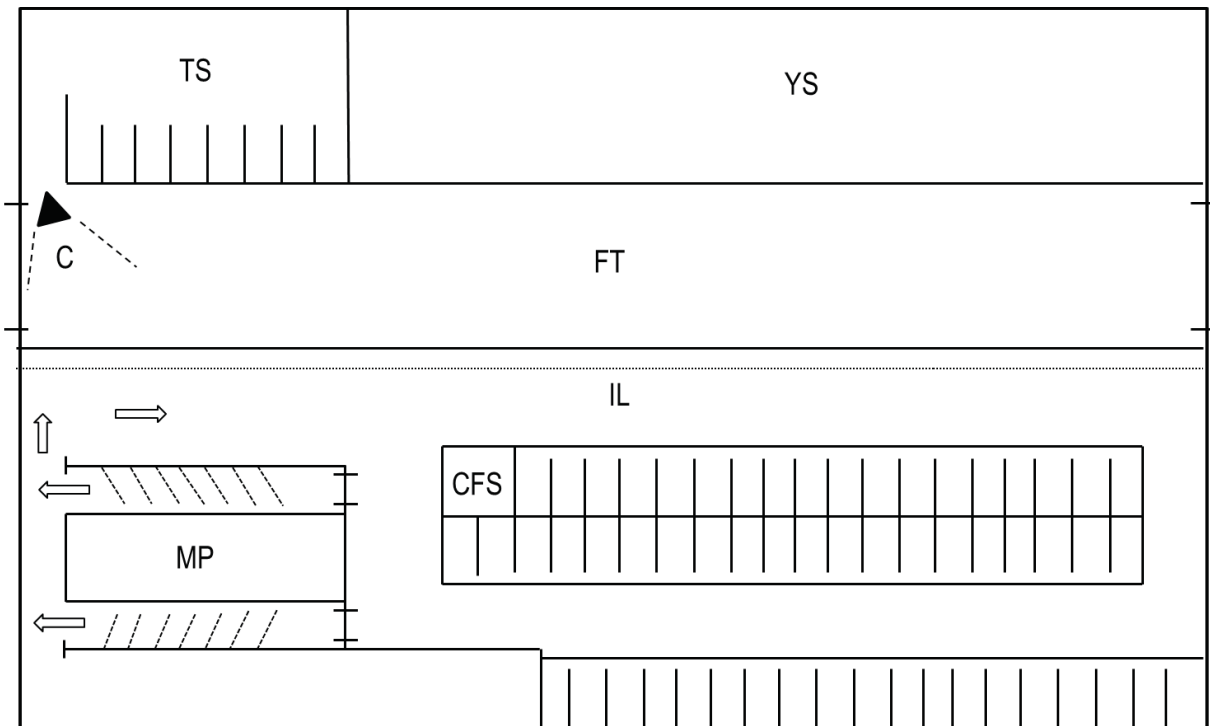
Sketch of floorplan of commercial dairy farm 2.
